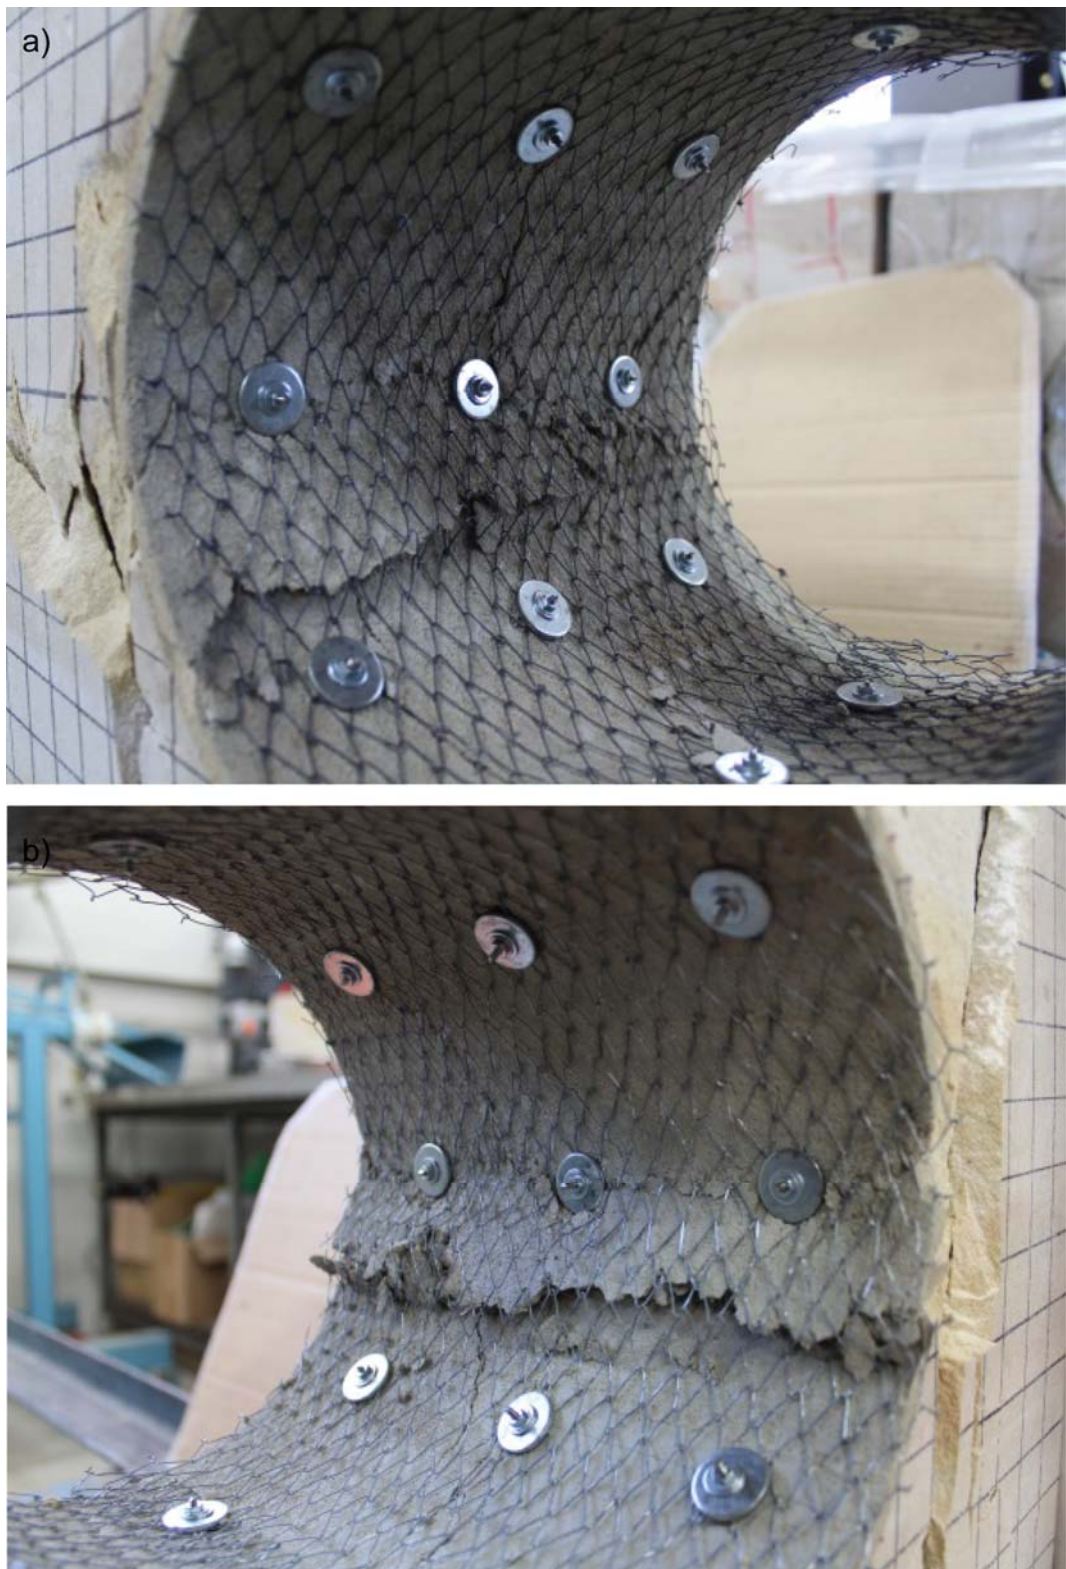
Excavation surface with a double layer after failure a) Specimen No.14 b) Specimen No.15.
